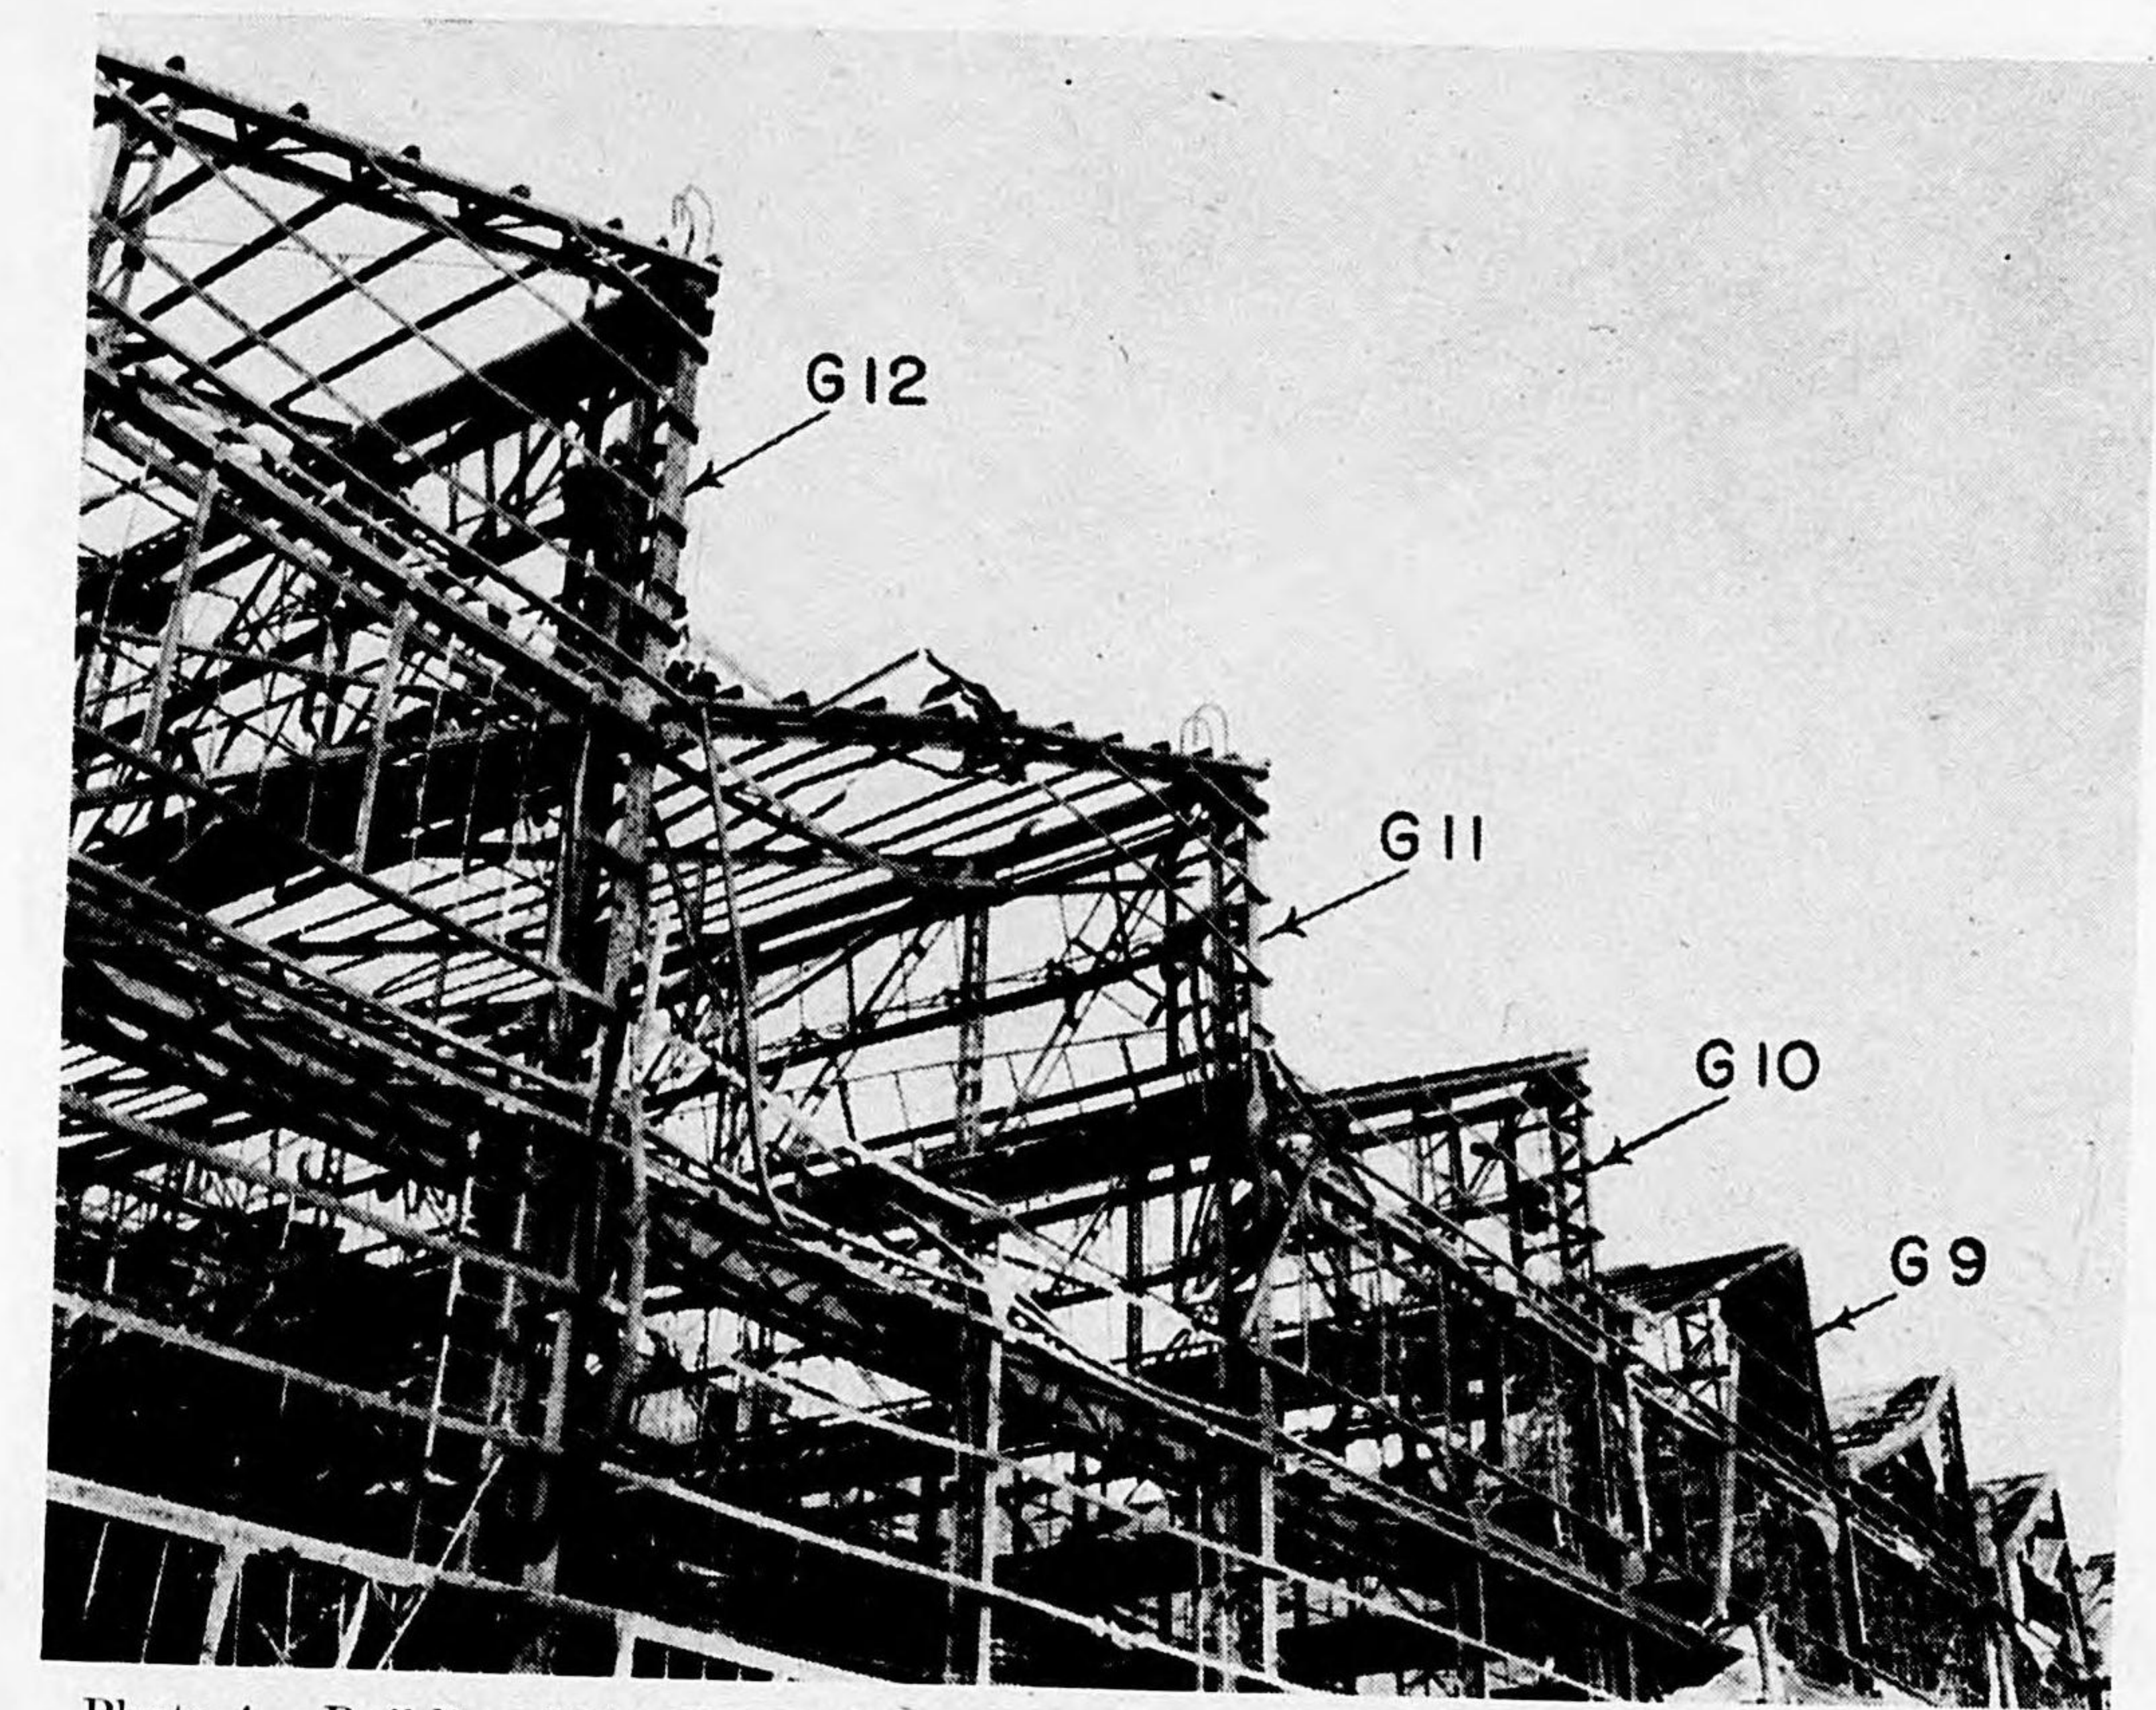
Building 301a, Bomb 30; damage between Columns G12 and G11 looking NE.
